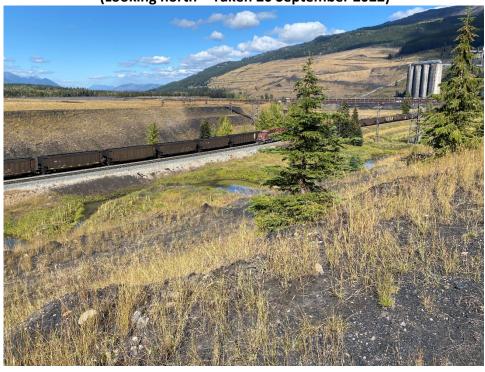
Lagoon D bench typical conditions. (Looking east – Taken 20 September 2022)
